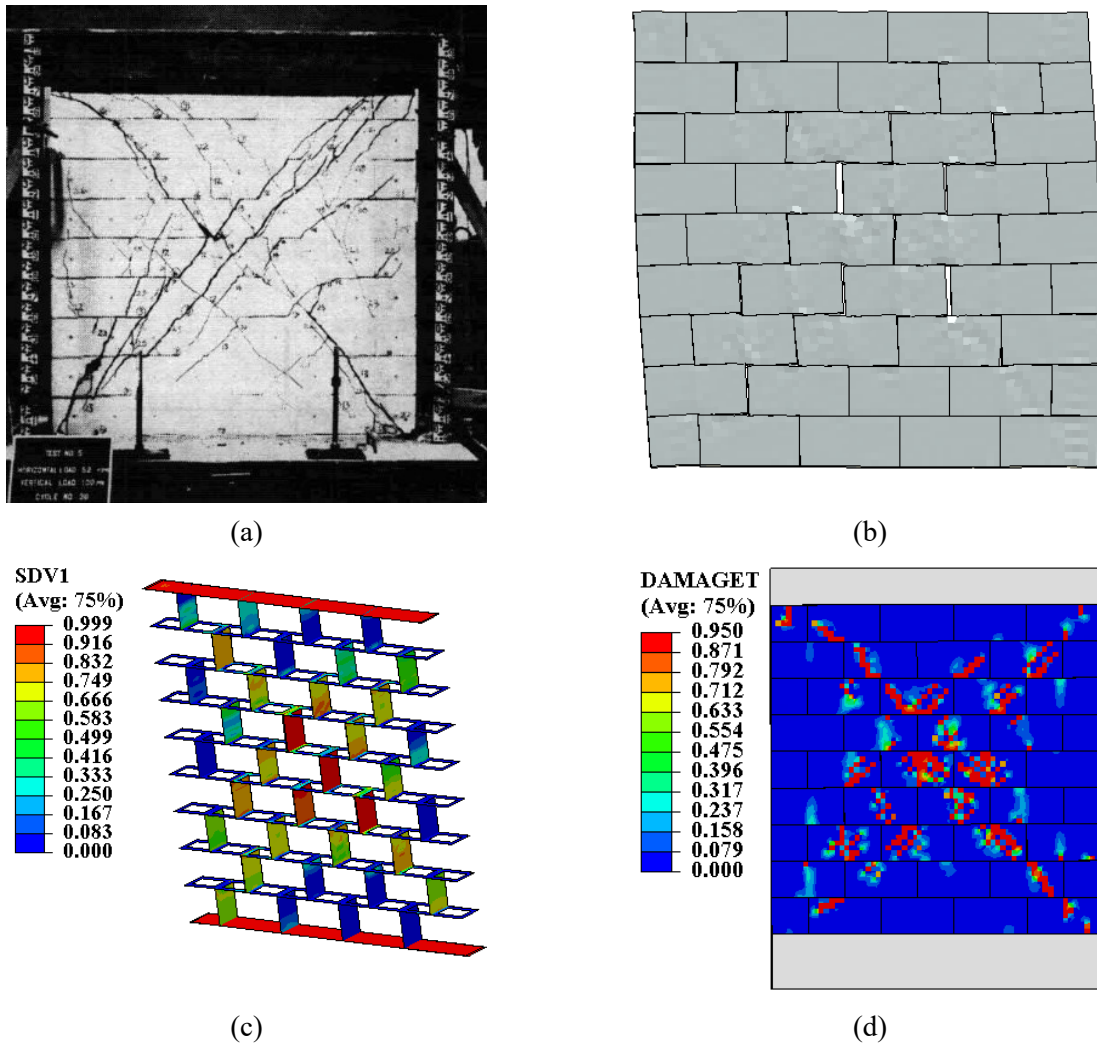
Failure modes of the RM wall: (a) experimental test by Shing et al. (1991), (b) deformed shape of wall, (c) tensile damage of mortar joints, and (d) tensile damage of concrete units
